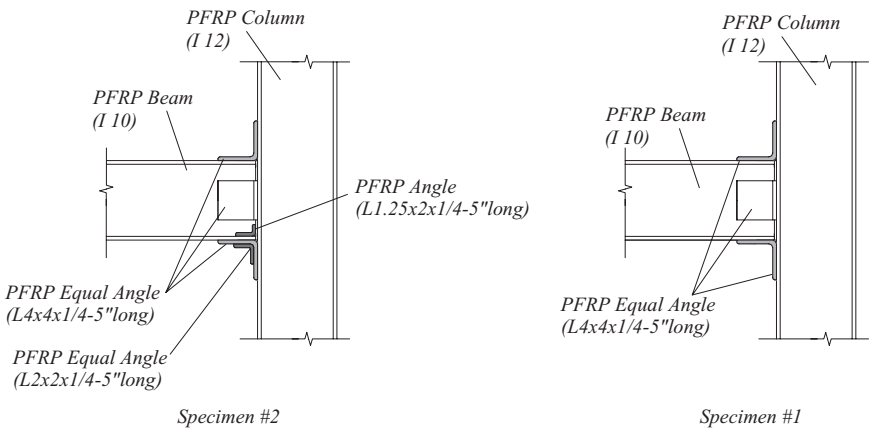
Beam-to-column bonded specimens details. Source: Sanders et al. (1996).
